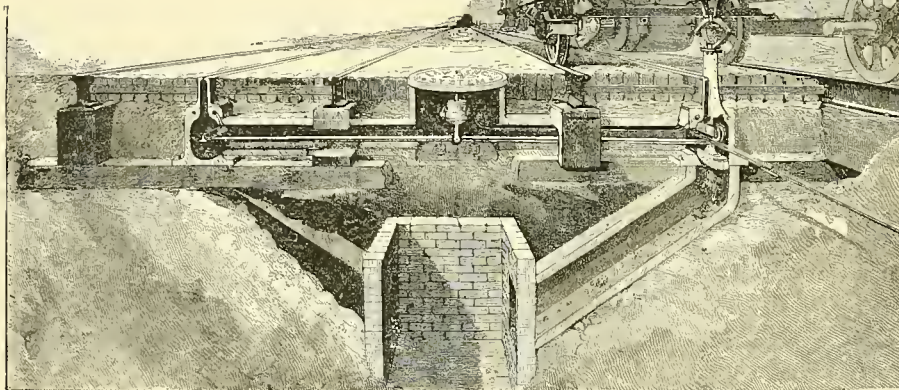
THE LAWRENCE UNDERGROUND ELECTRIC RAILWAY.
